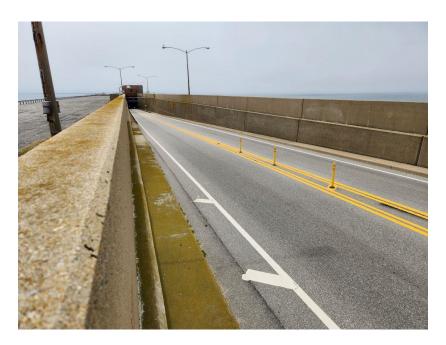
Typical Open Cut, Leading to Tunnel Portal
